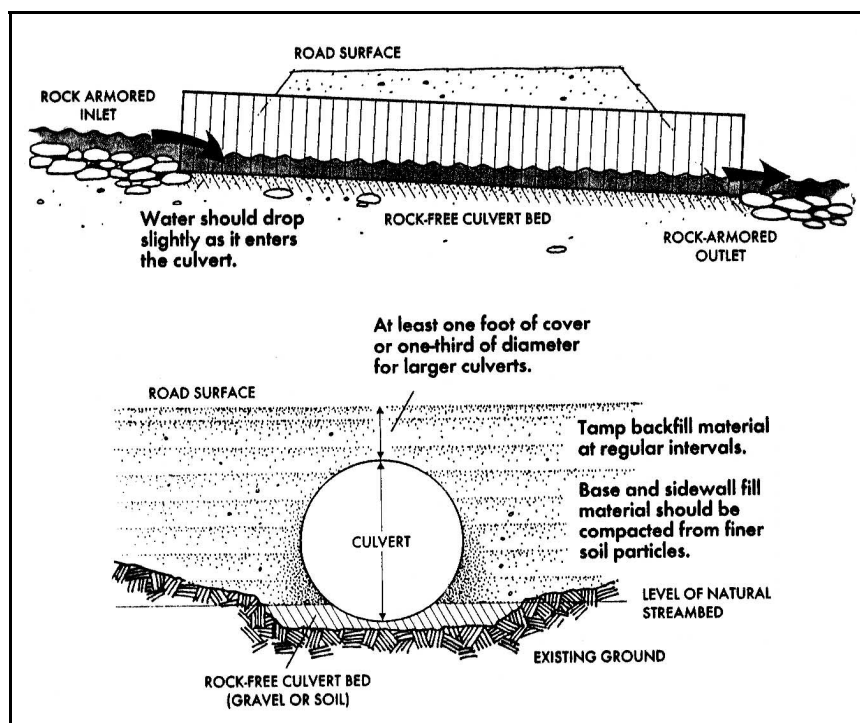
Design and installation of pipe culvert at stream crossing (Montana State University, 1991).
